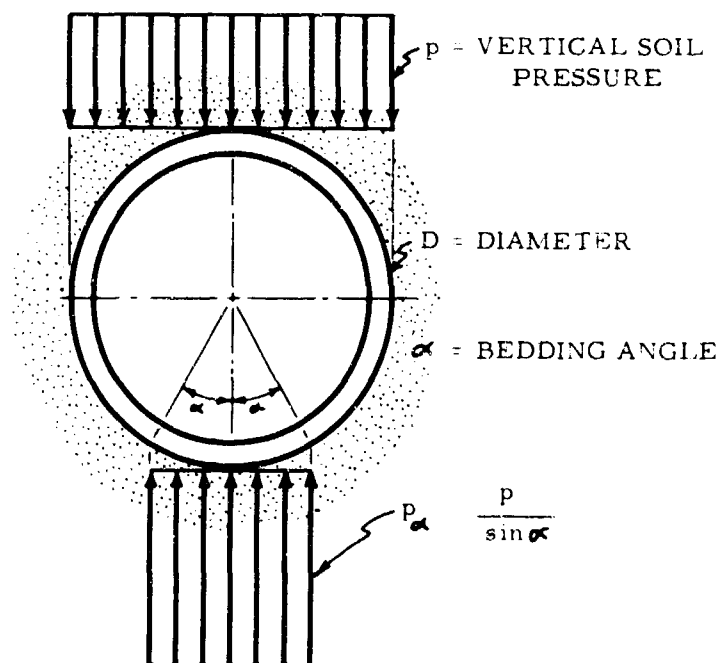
Typical Soil Loading Assumptions for Buried Conduit
